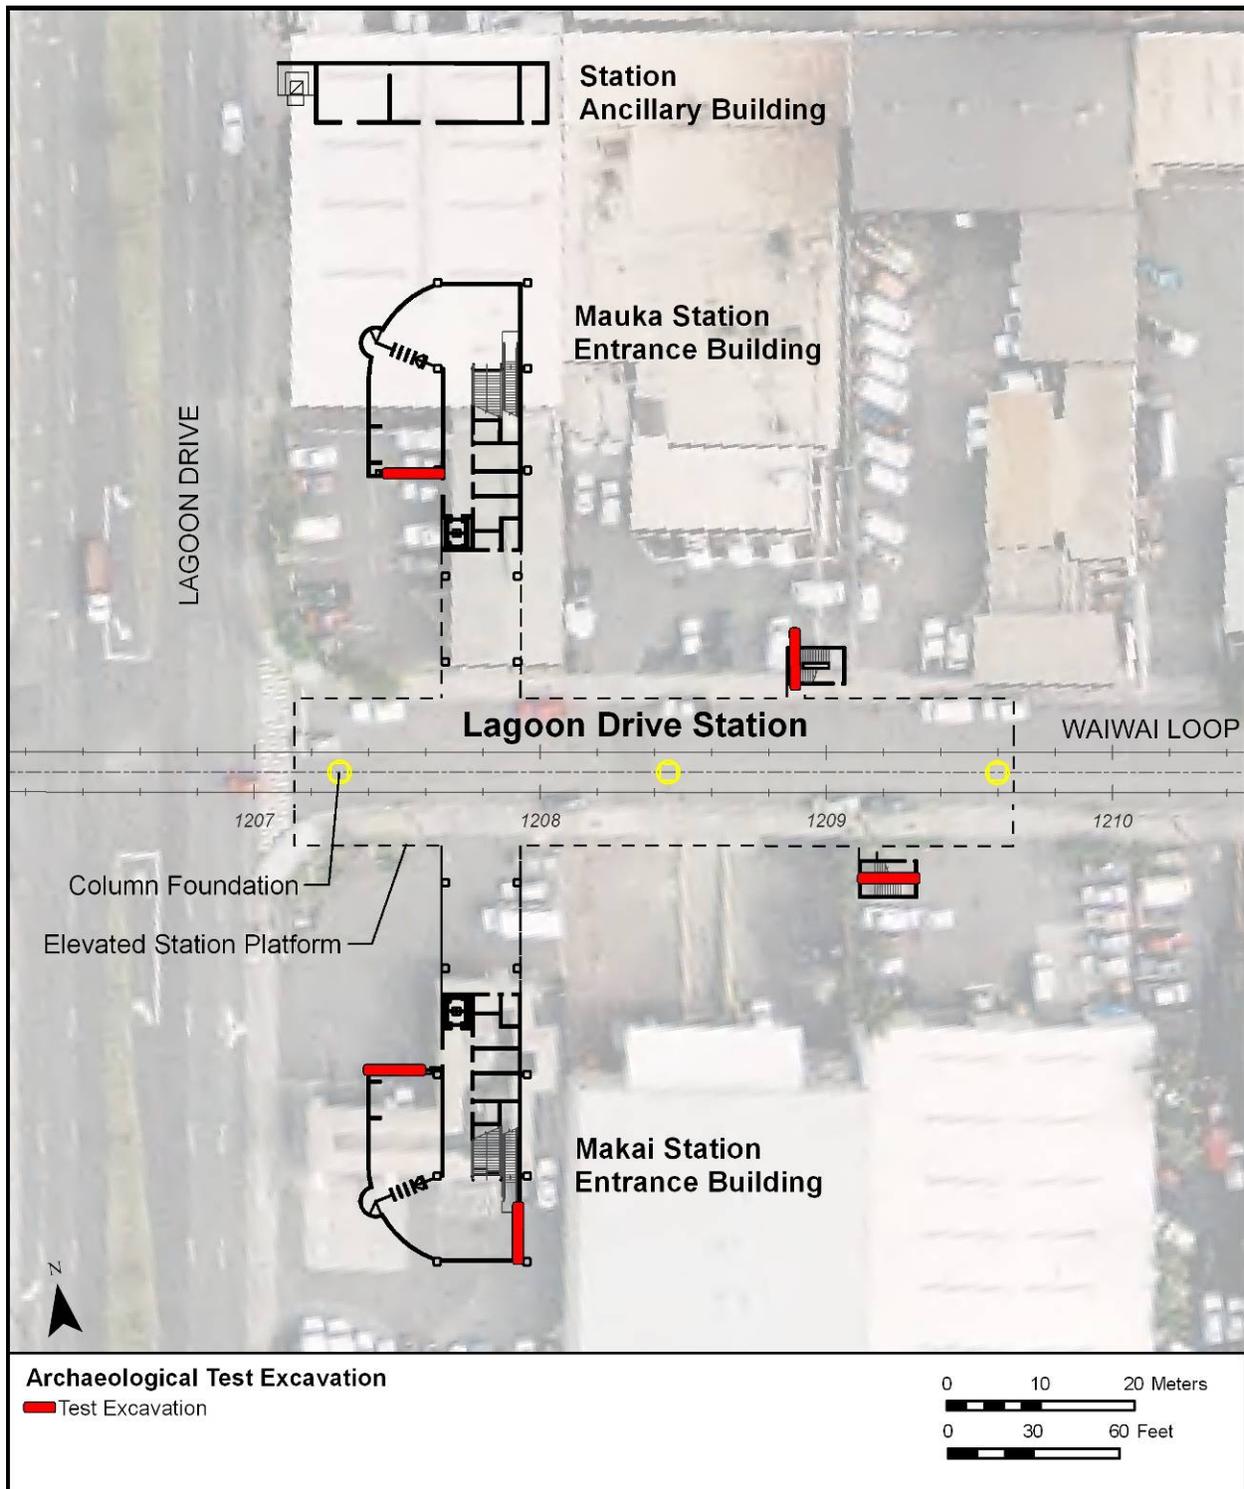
Lagoon Drive Station, 5 20x2 test excavations (2 at Mauka Station Entrance Building, one at *mauka* access and 2 at Makai Station Entrance Building)
